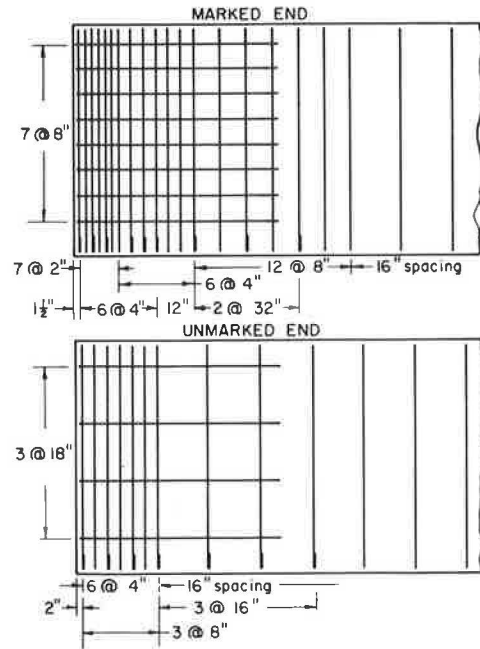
Steel reinforcement at the ends of Series 14 test girder.
